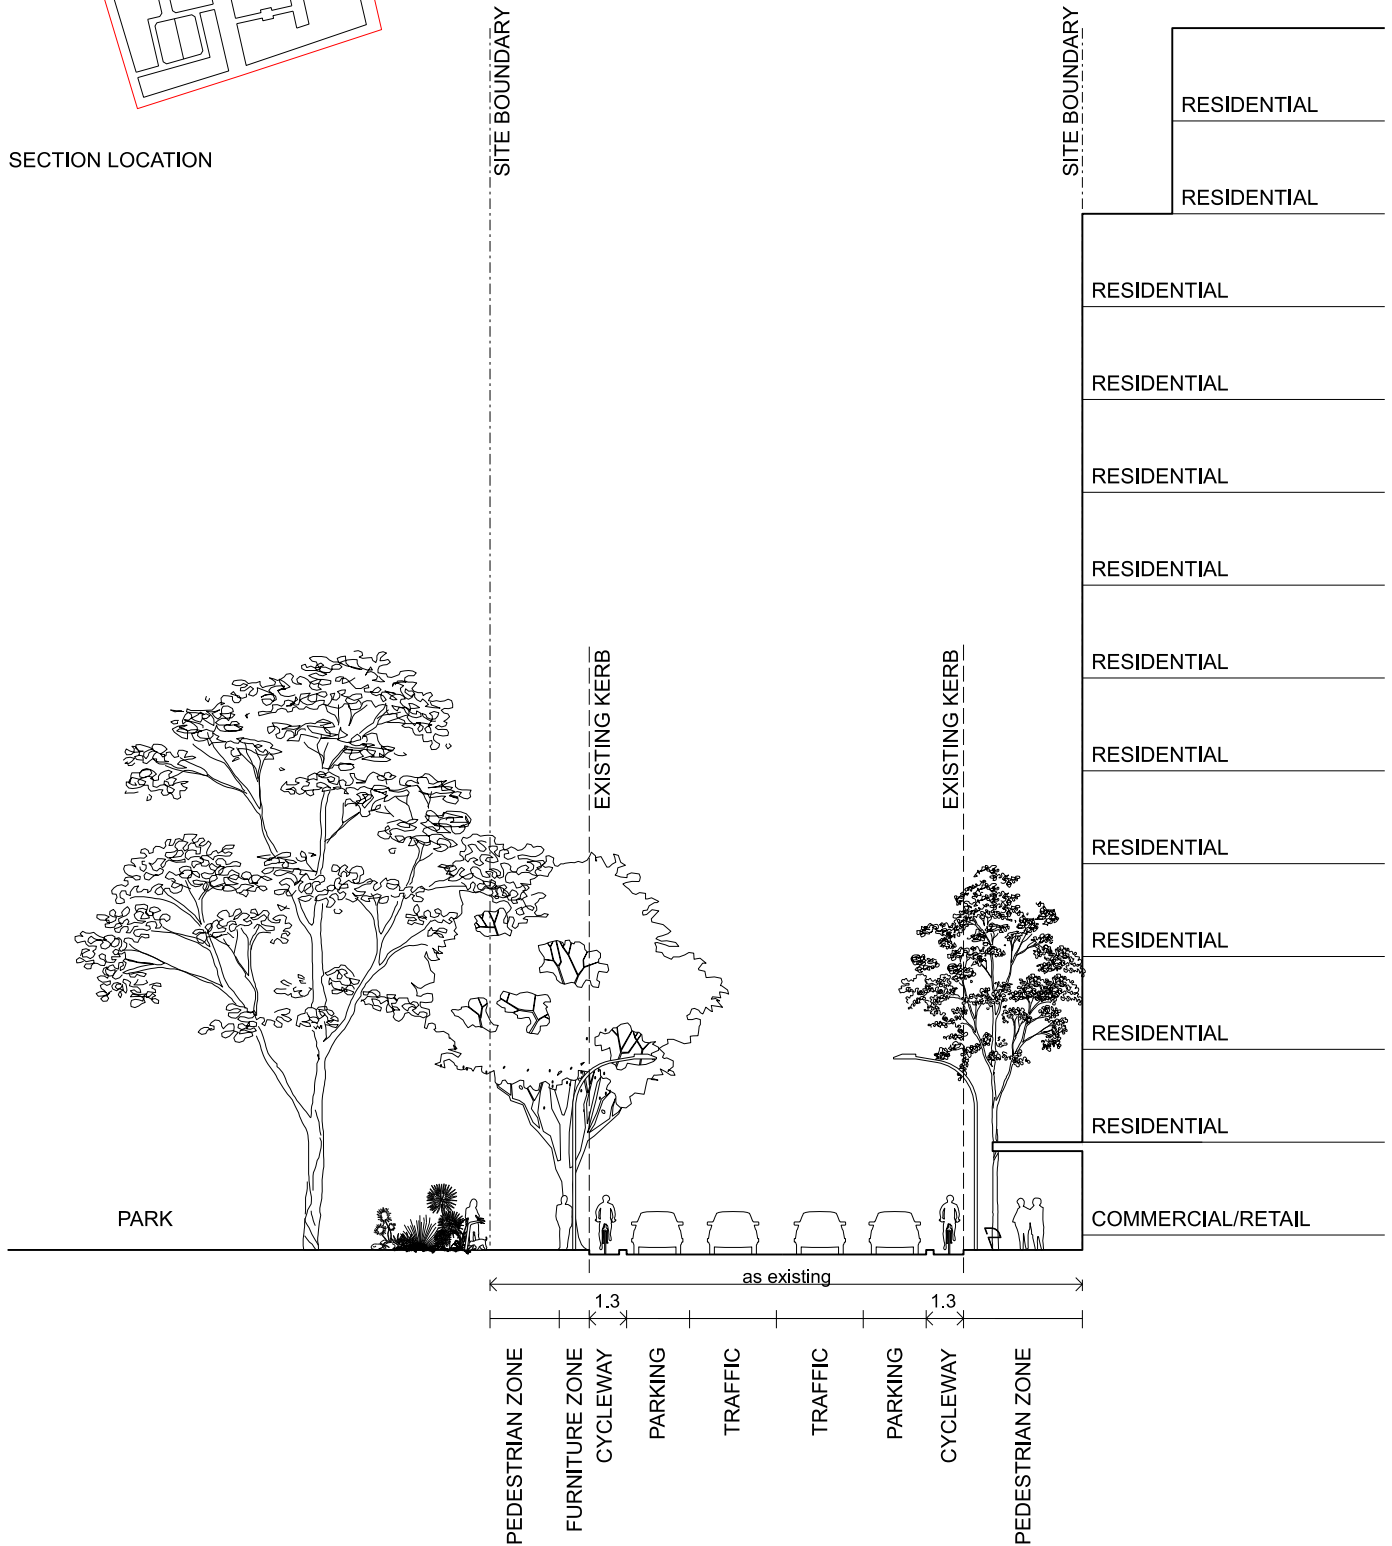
(c): STREET CROSS SECTION - Pitt Street extension
